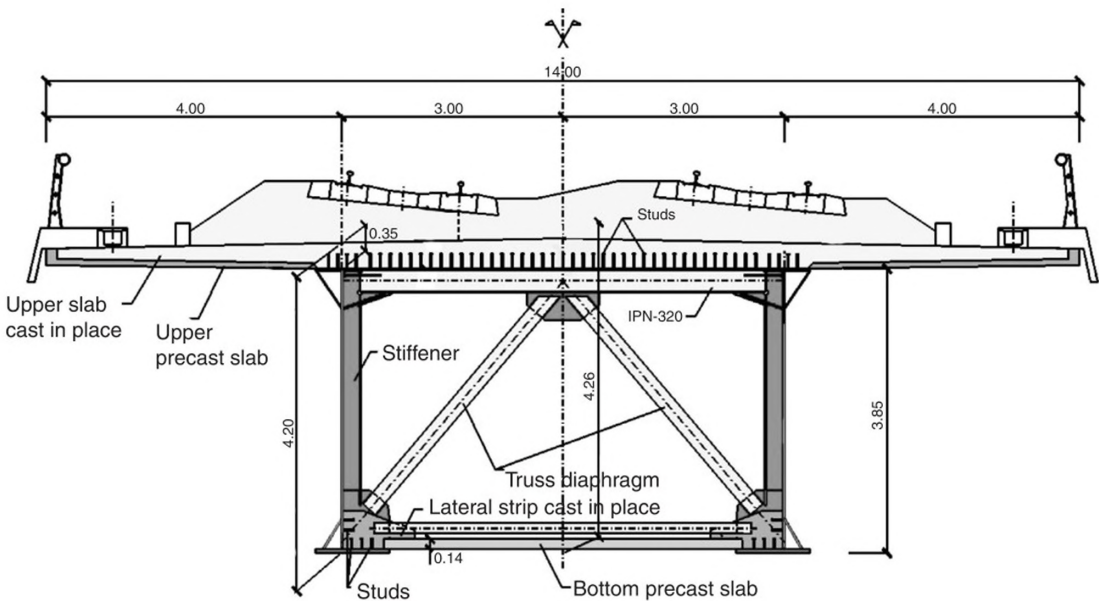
Mid-span cross-section. Steel-concrete composite solution.
